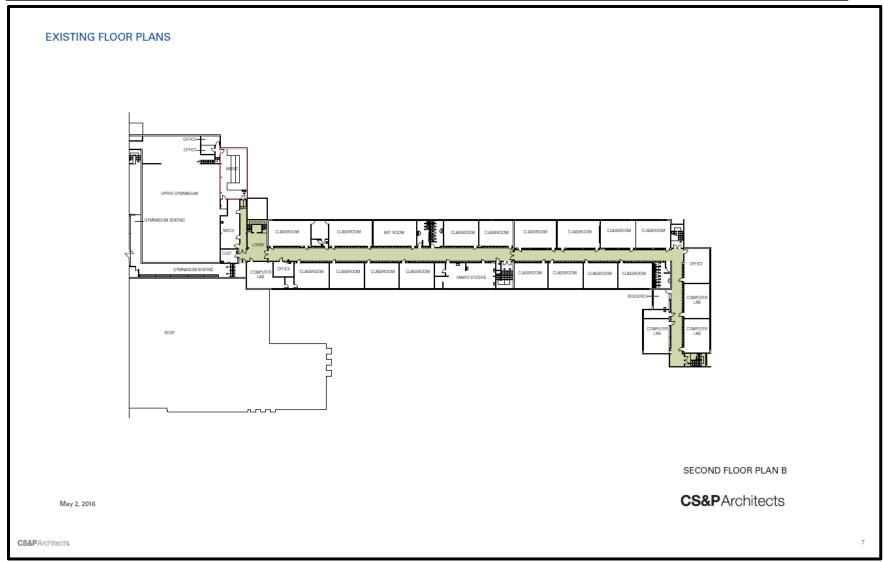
East Wing (Plan B) Second Floor (CS&P Architects 2016:7)
